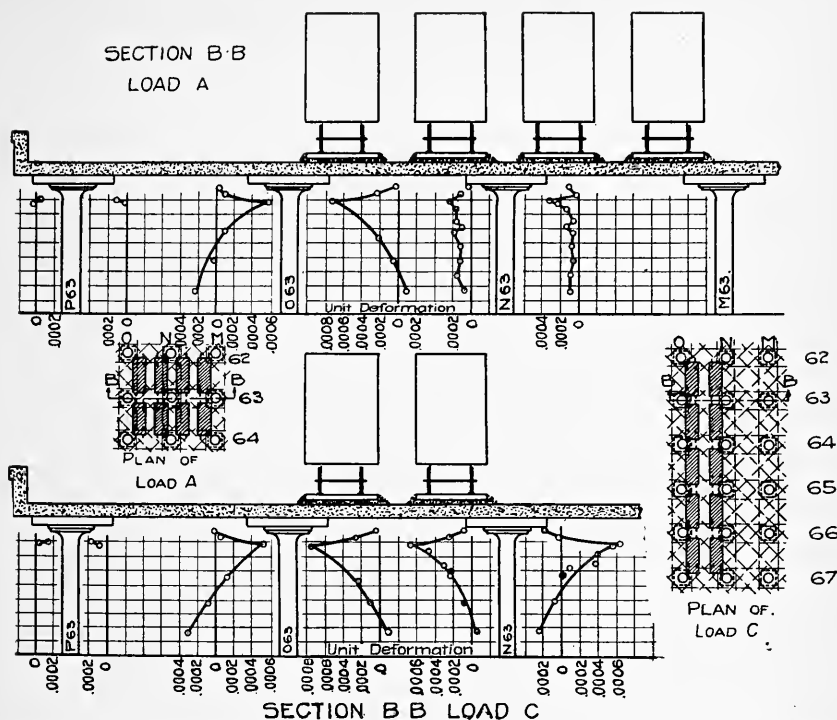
DEFORMATION IN COLUMNS CUT BY SECTION B-B (NORMAL TO TRACKS) OF SOO TERMINAL STRUCTURE.
